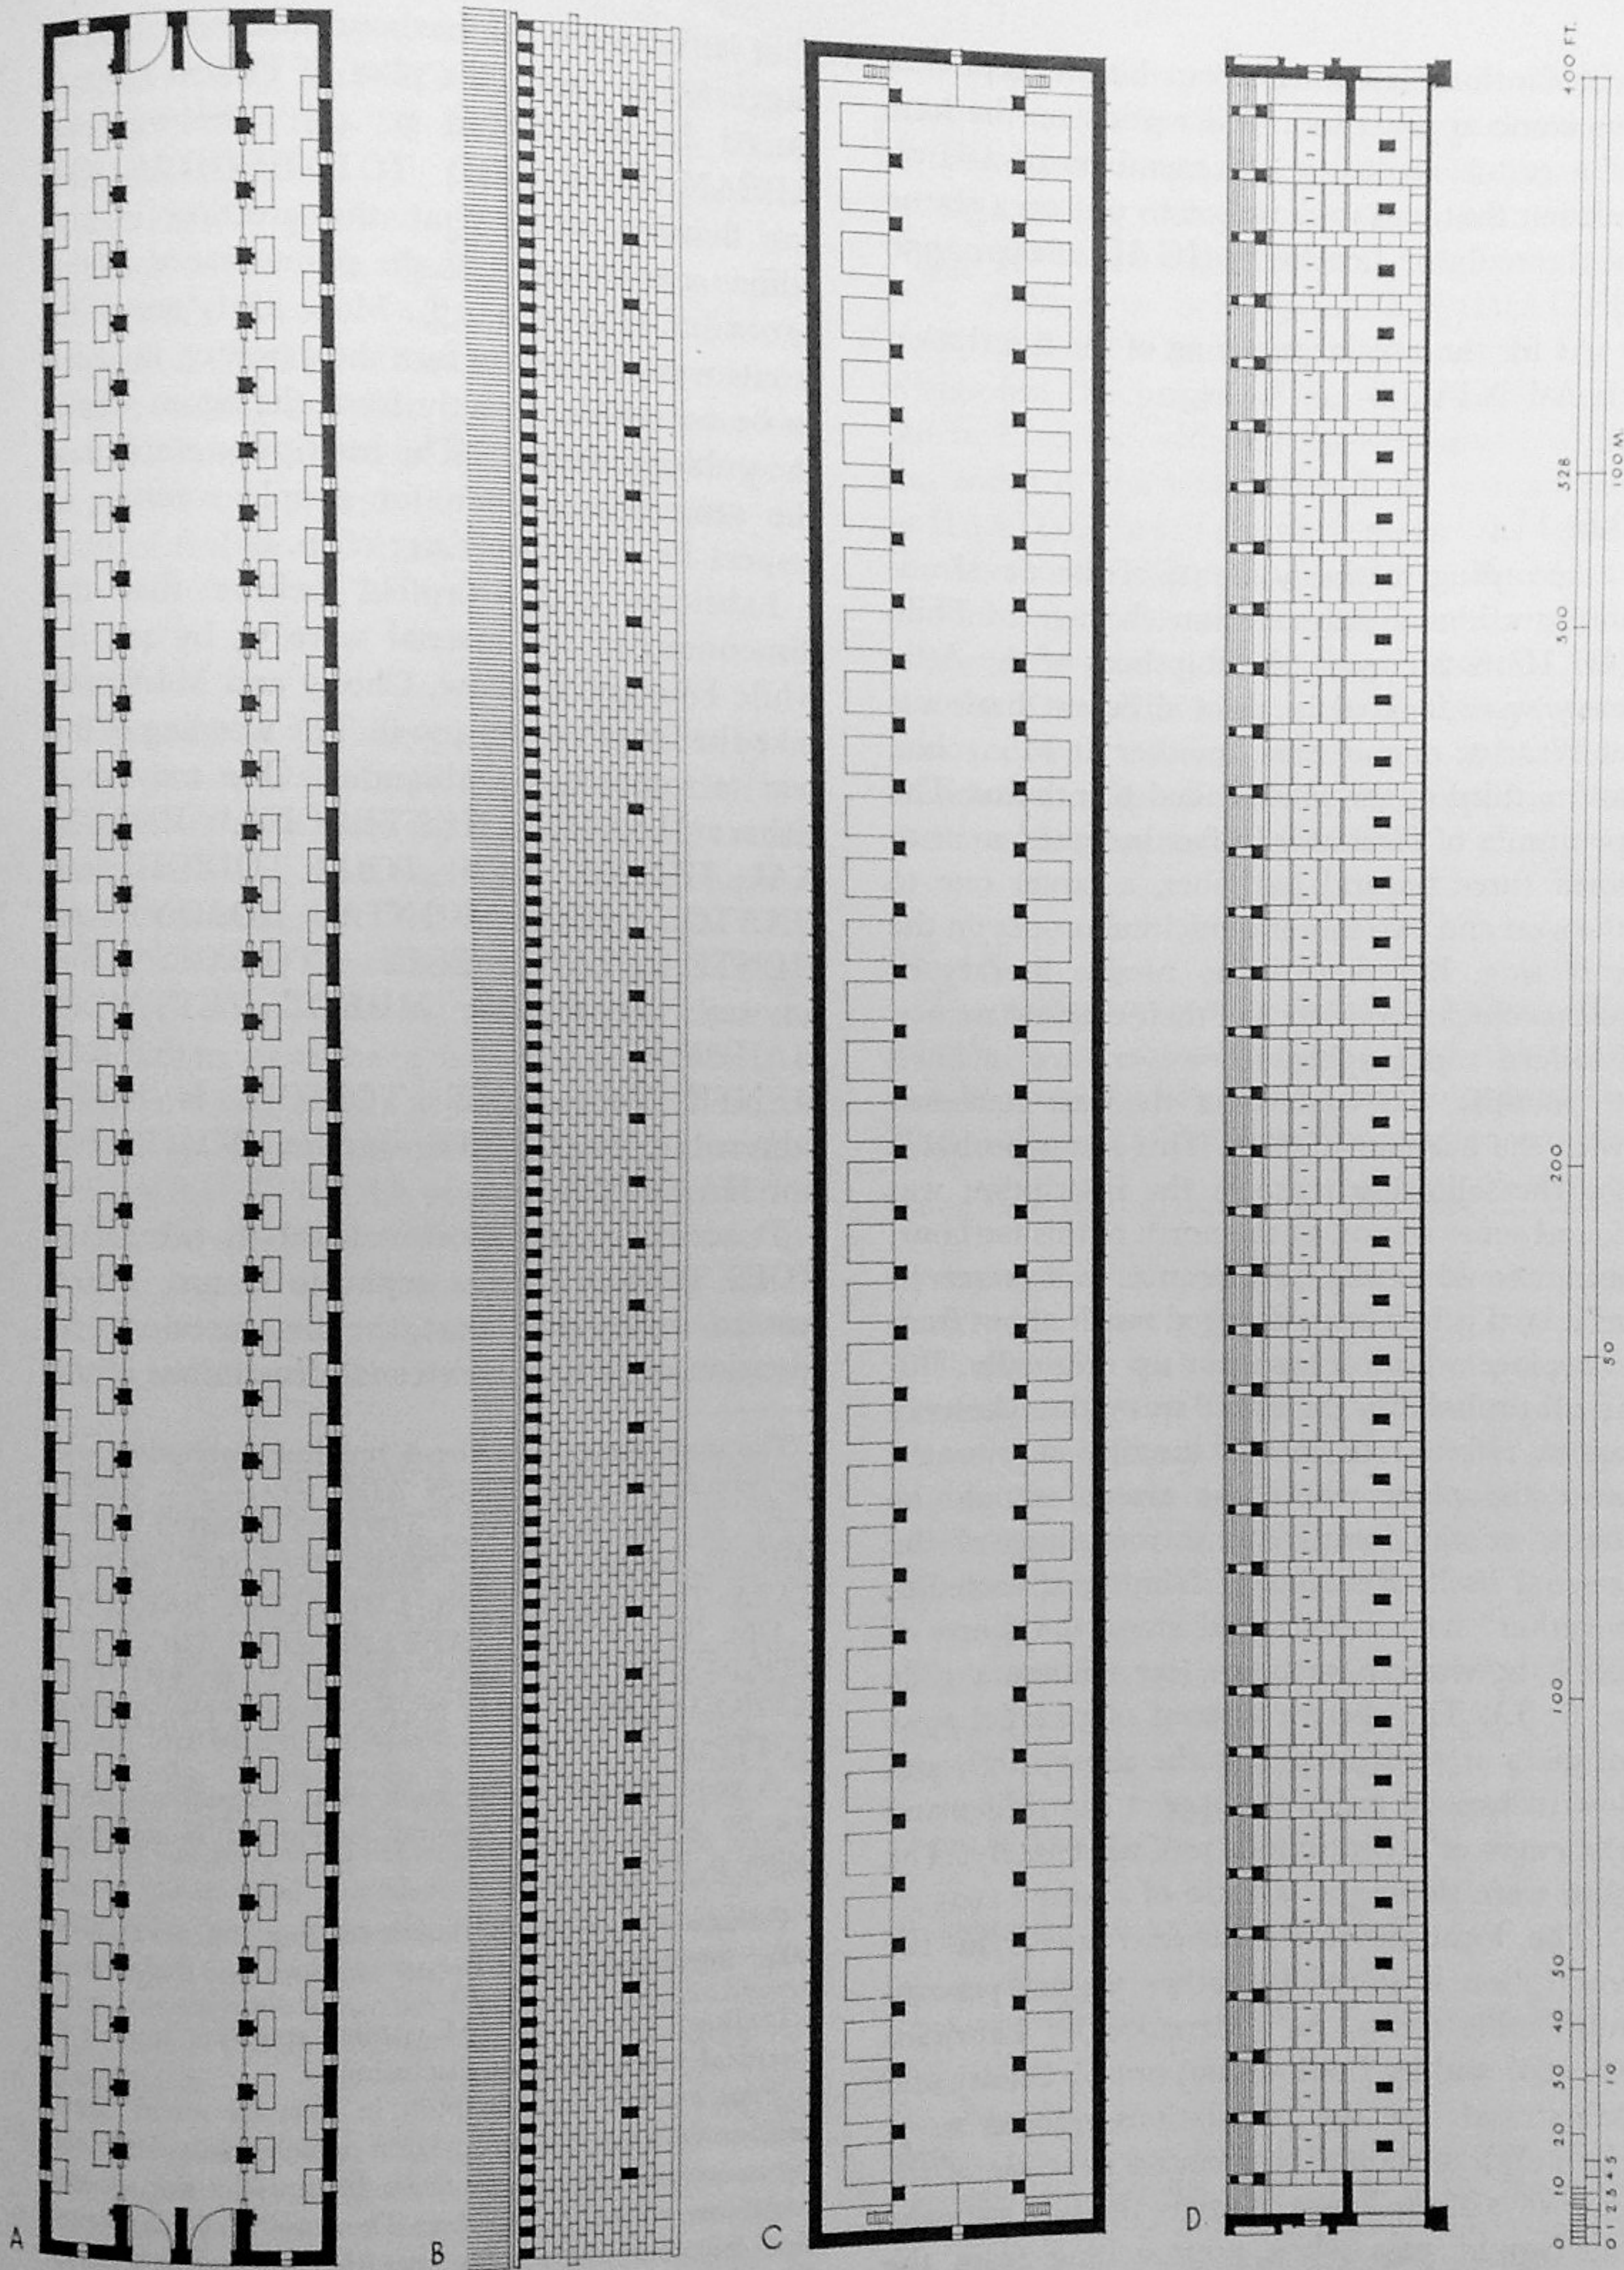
Reconstruction of the Arsenal. A: ground plan. B: side elevation. C: first floor (midway galleries). D: longitudinal section (K.J.).
